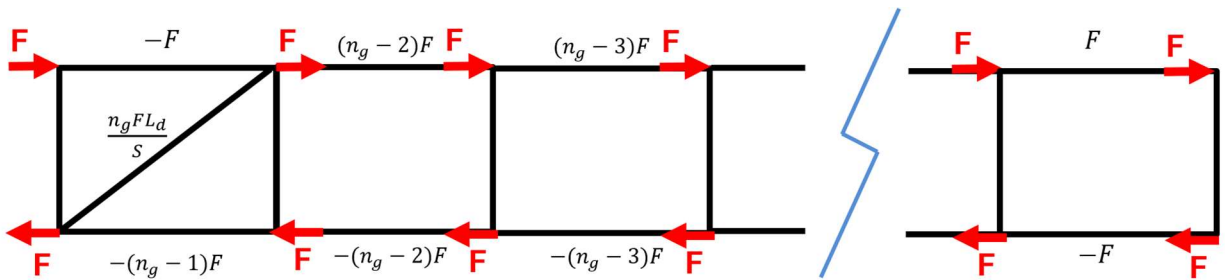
Z-Frame Single Brace Forces Exterior Bay
